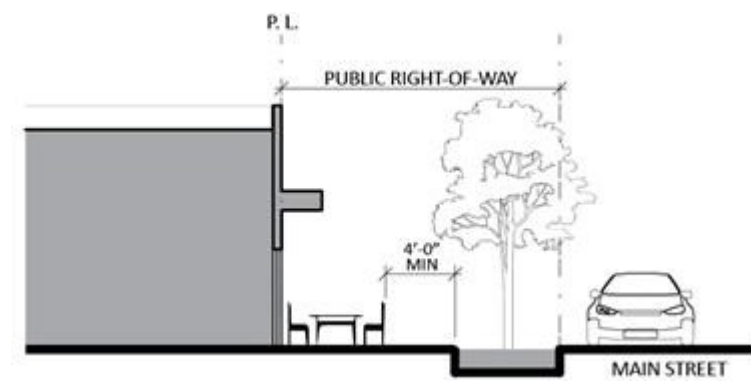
Example of an outdoor dining area in the public right-of-way without a barrier.
